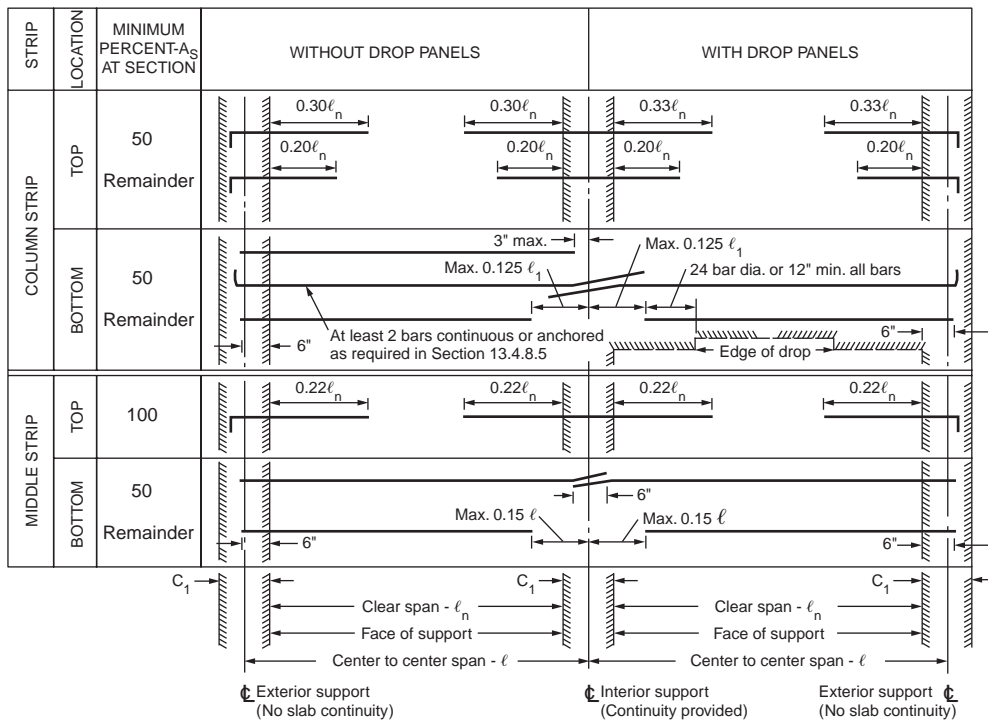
Minimum extensions for reinforcement in two-way slabs without beams. (Source: ACI Committee 318, 1992.)
